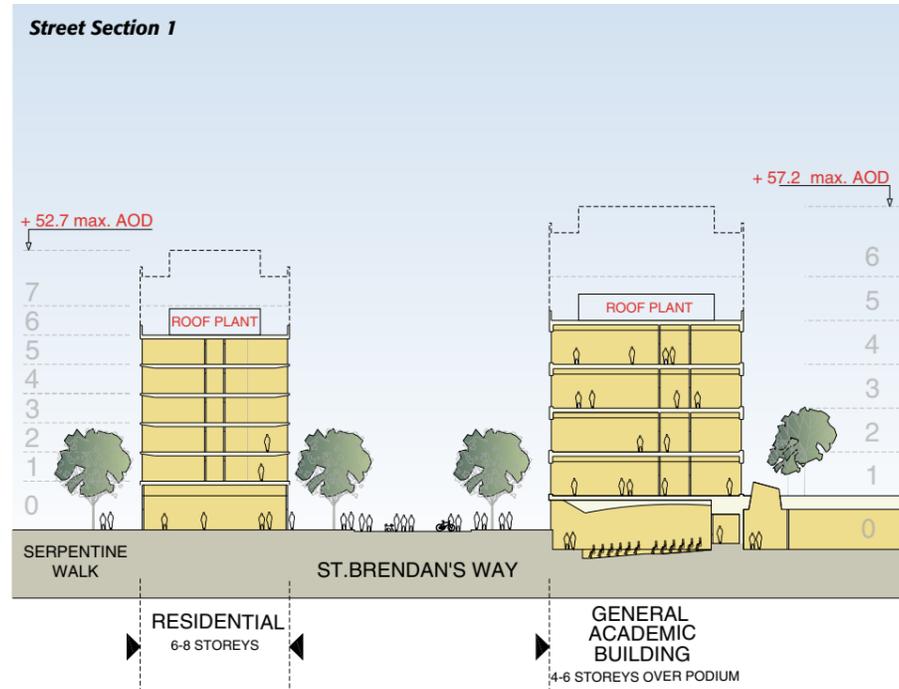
Section 1 illustrates a section along St Brendan's Way, through a 6-8 storey building, (if in residential use), or a 6 storey building maximum (if non-residential use), and a general academic building of 4-6 storeys over podium. The buildings will be a maximum of 52.7 and 57.2 metres above ordnance datum (A.O.D), including any rooftop plant.
